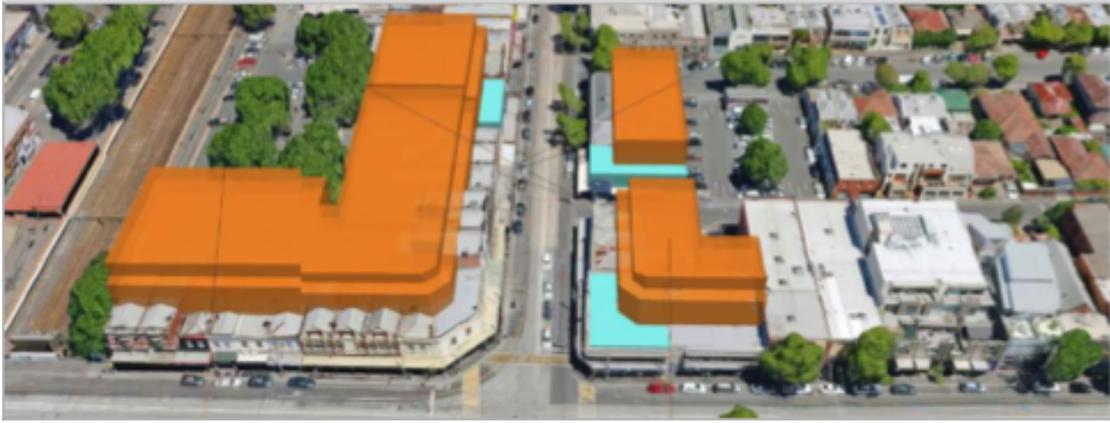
Elevated view from Church Street looking west along Swan Street .The buildings extending both ways from the south-west corner of Church and Swan are some of the finest buildings in the area. Note also that there is no obligation under this or other amendments to conserve any of the heritage fabric between the façade and the higher built form
